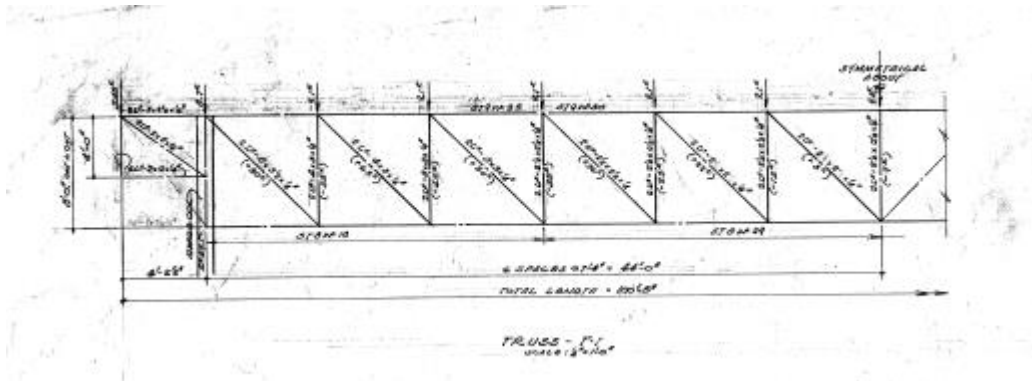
Truss T-1 Profile from CFAC Roof 4.
